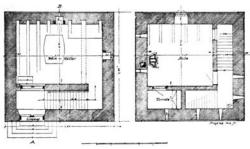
and 7 Plans, section and constructive details of the cula in Groşerea (Janeke 1932, 64-65)
